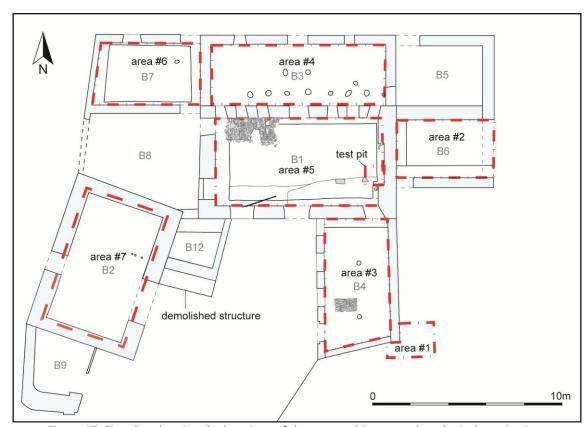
Site plan showing the locations of the areas subject to archaeological monitoring.
